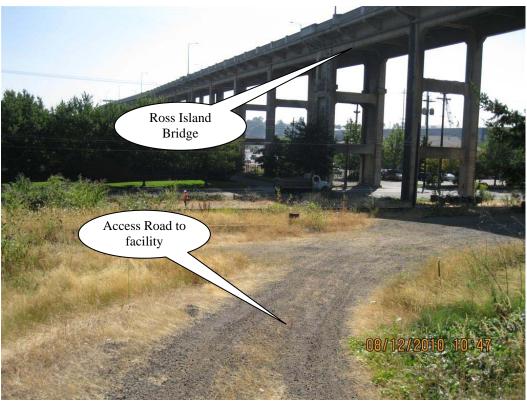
Gravel access road to facility. Photograph is looking towards the southeast at the Ross Island Bridge (US 026).
